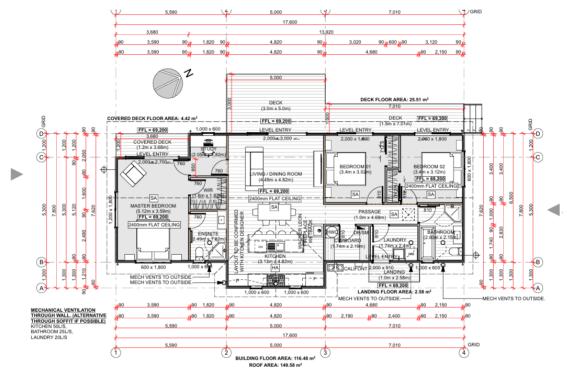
The above image shows the proposed floor layout for the application's new dwelling.
